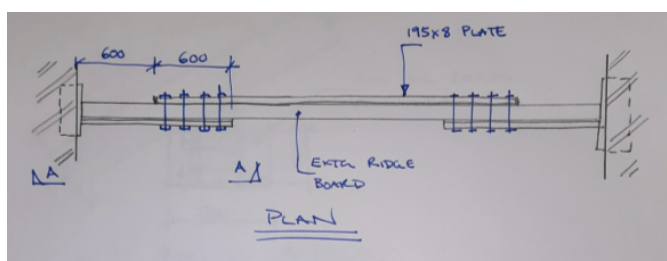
The Morton Partnership: ridge beam stiffening splints
